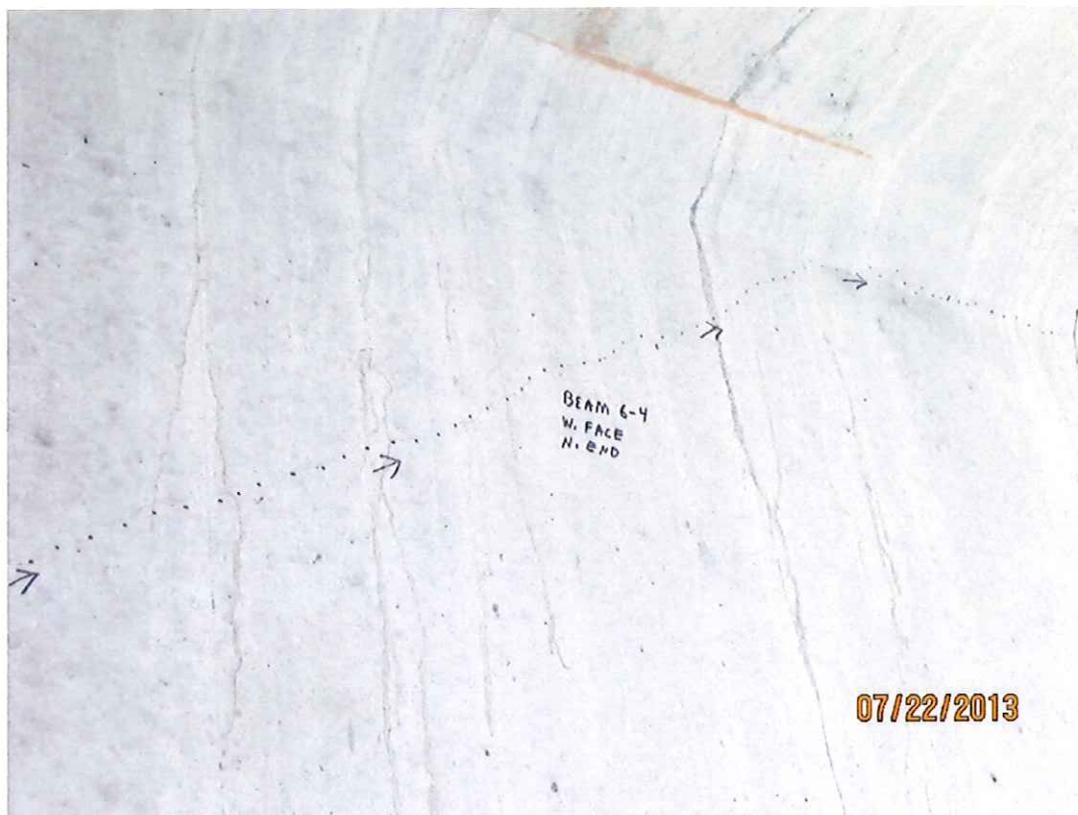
Diagonal crack turning longitudinal on west face of Beam 6-4 at north end
